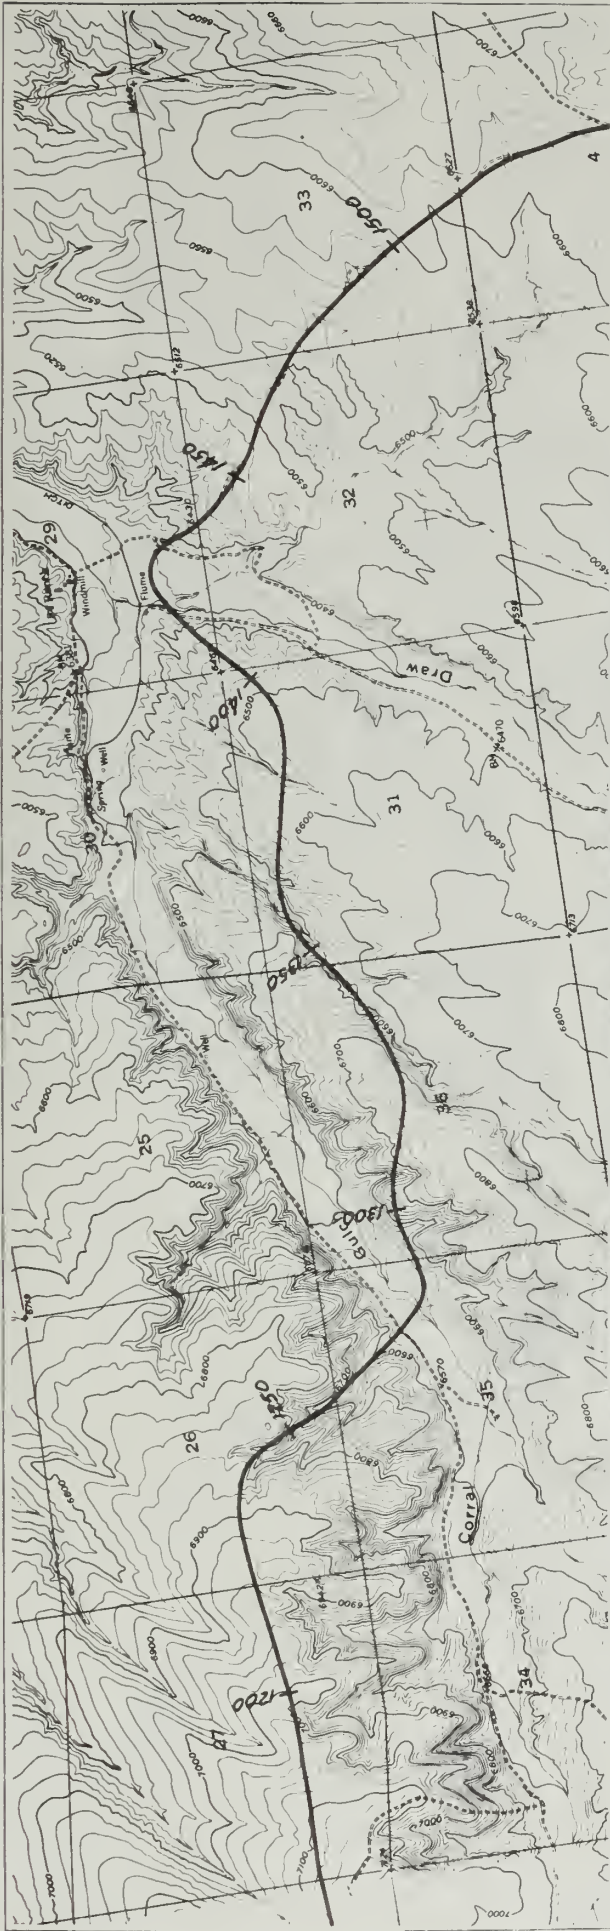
ROAD ALIGNMENT PLAN AND PROFILE
